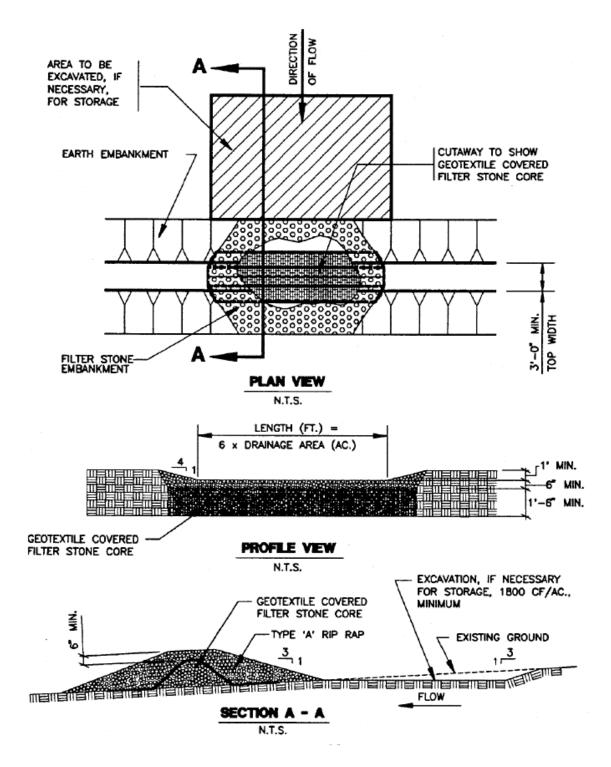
Stone Outlet Structure Installed in Conjunction with a Sediment Trap
